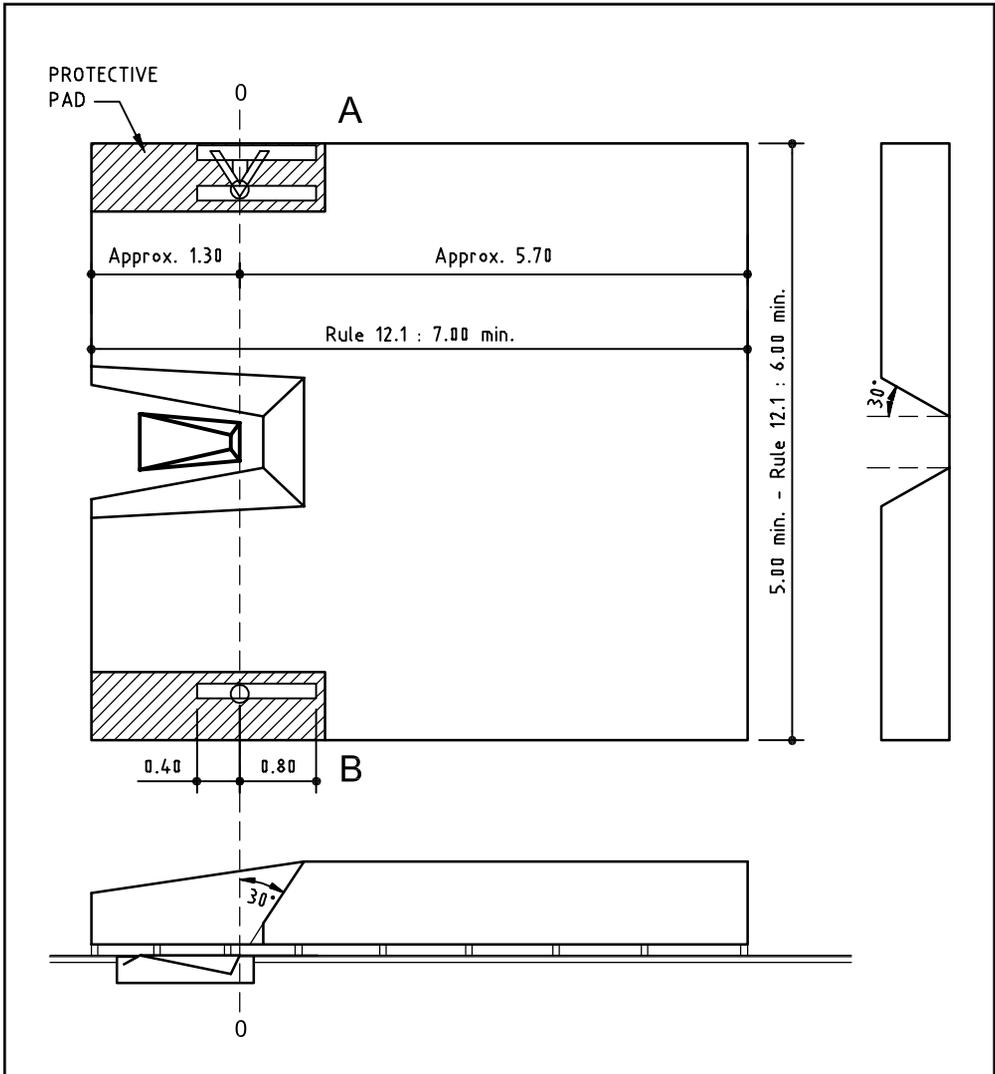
Landing area for pole vault, top view, cross section and longitudinal section
